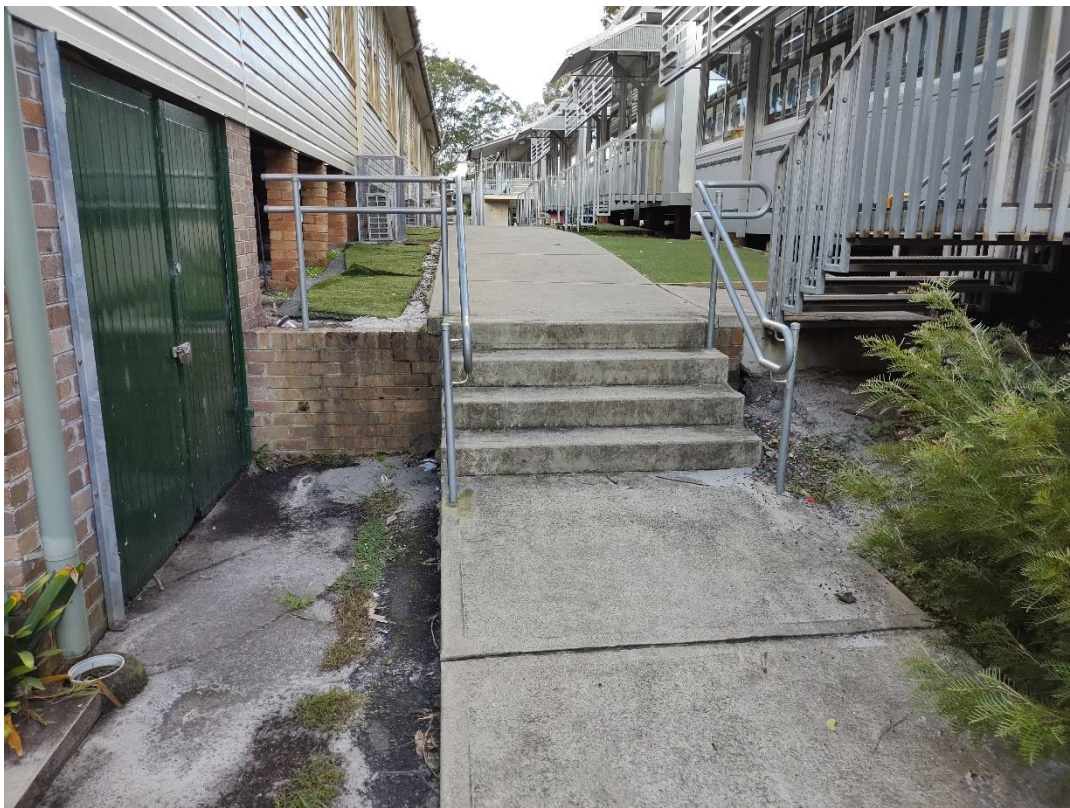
NNPS - Building J (left) and demountable buildings (right) in the south-western part of NNPS
